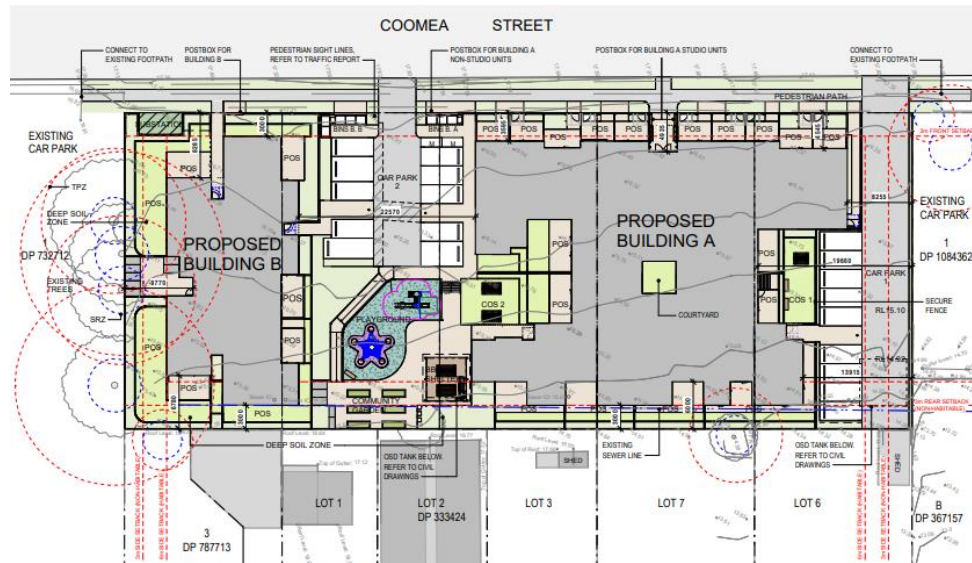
Site Plan of proposed development (Dwg No. DA01)
